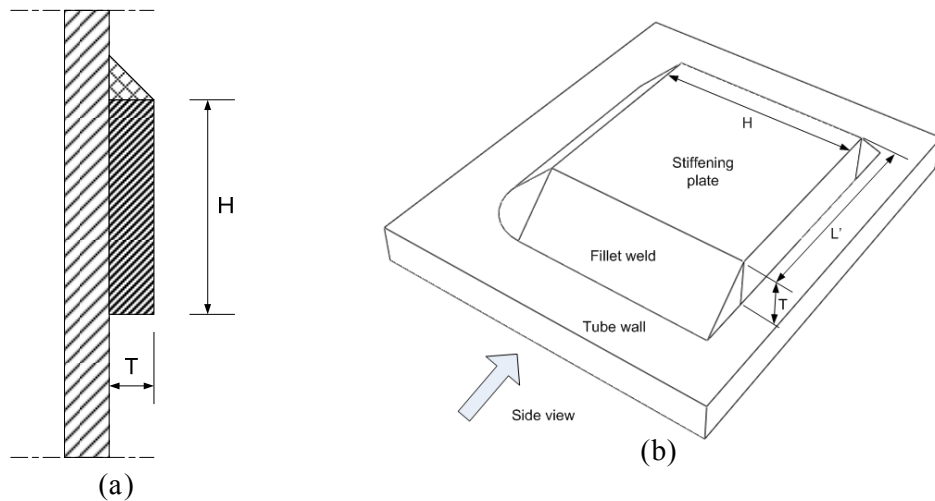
Details of stiffening plate: (a) side view (b) 3D view
